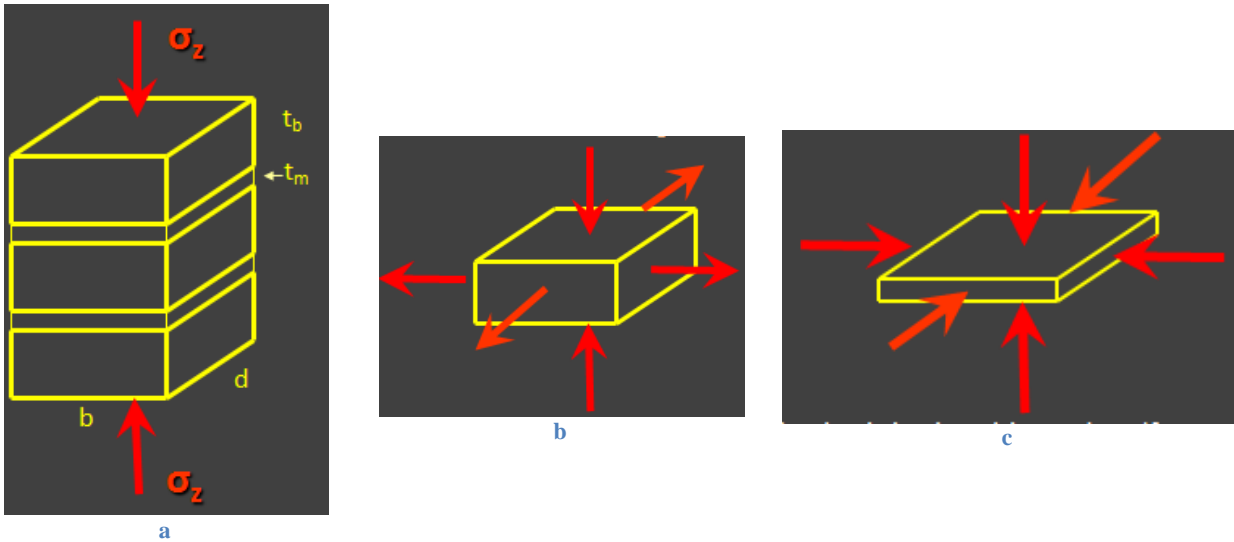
State of stresses within compressed masonry wallet (a), masonry unit (b) and mortar (c) (from E. Vintzilaou – “Lecture notes on Advanced Mechanics of Masonry”)
